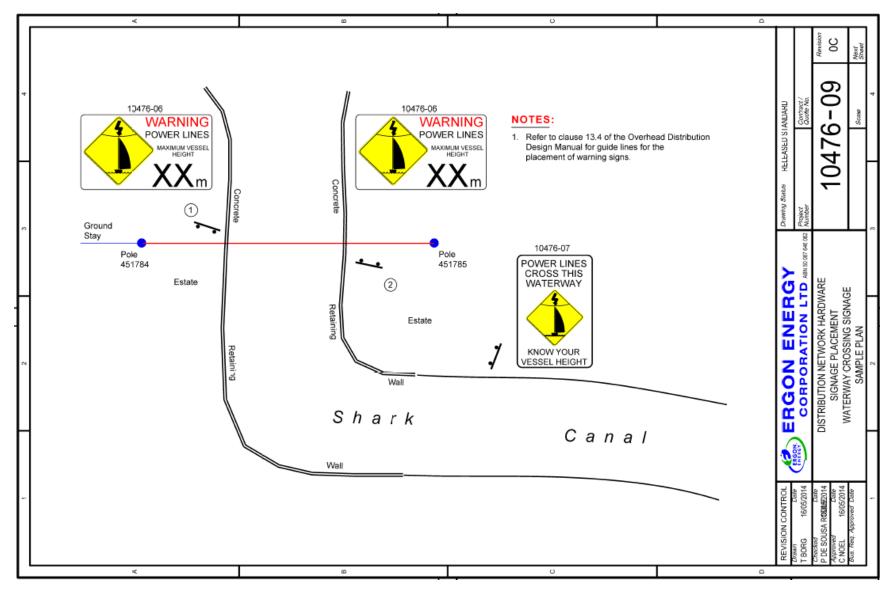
Waterways Crossing Sign - Conductor Heighting - Sample Plan
